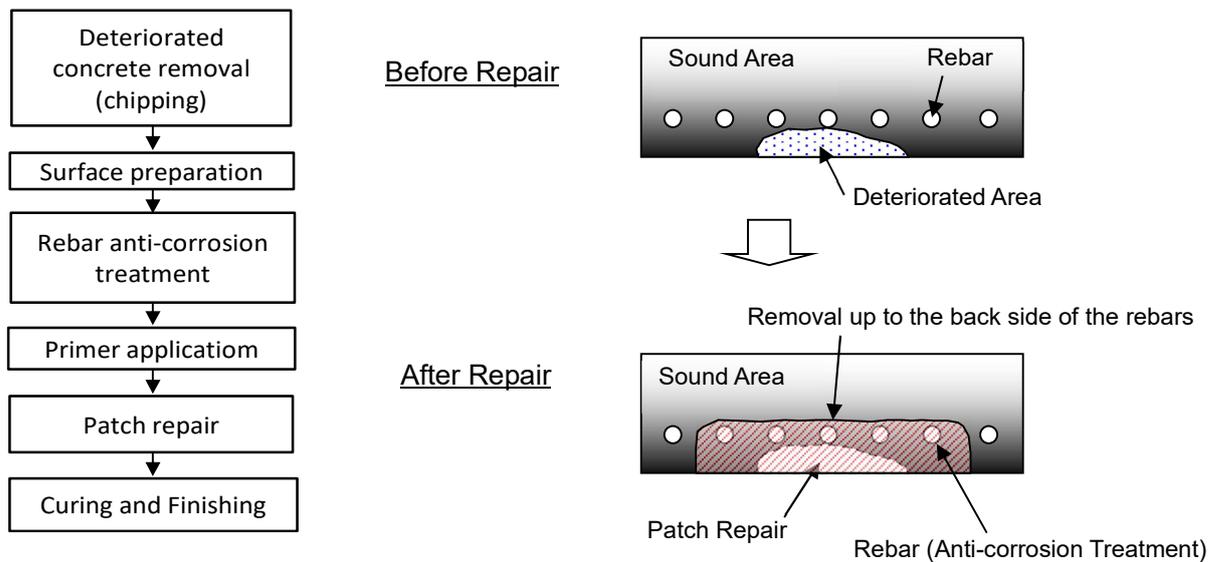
Construction flow of the section-repair method ²⁾
